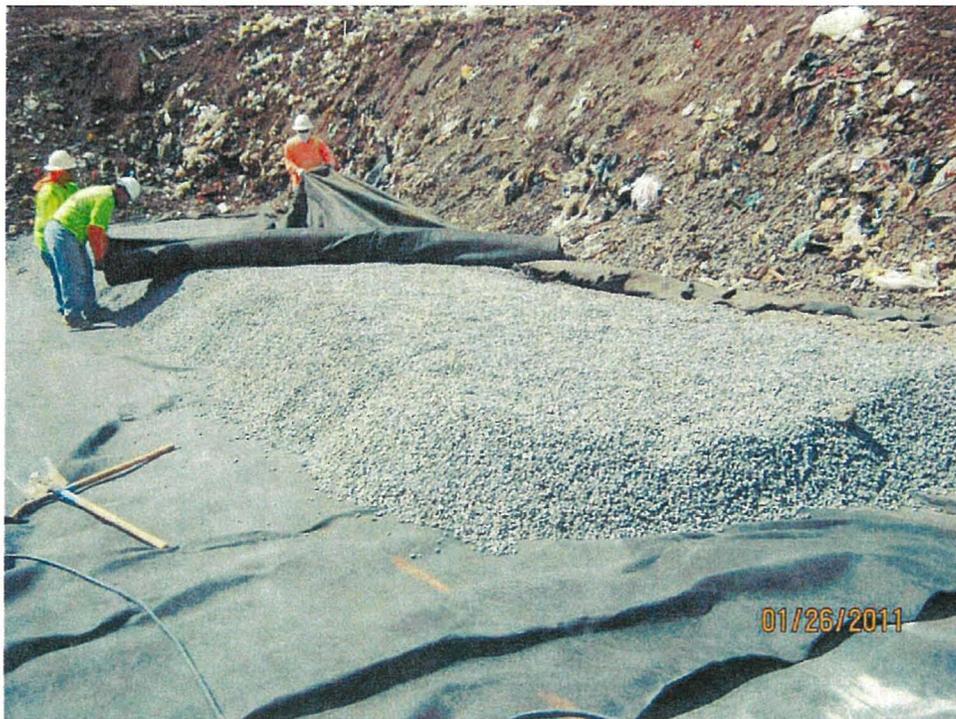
Placement of geotextile filter layer over LCRS drainage gravel.
